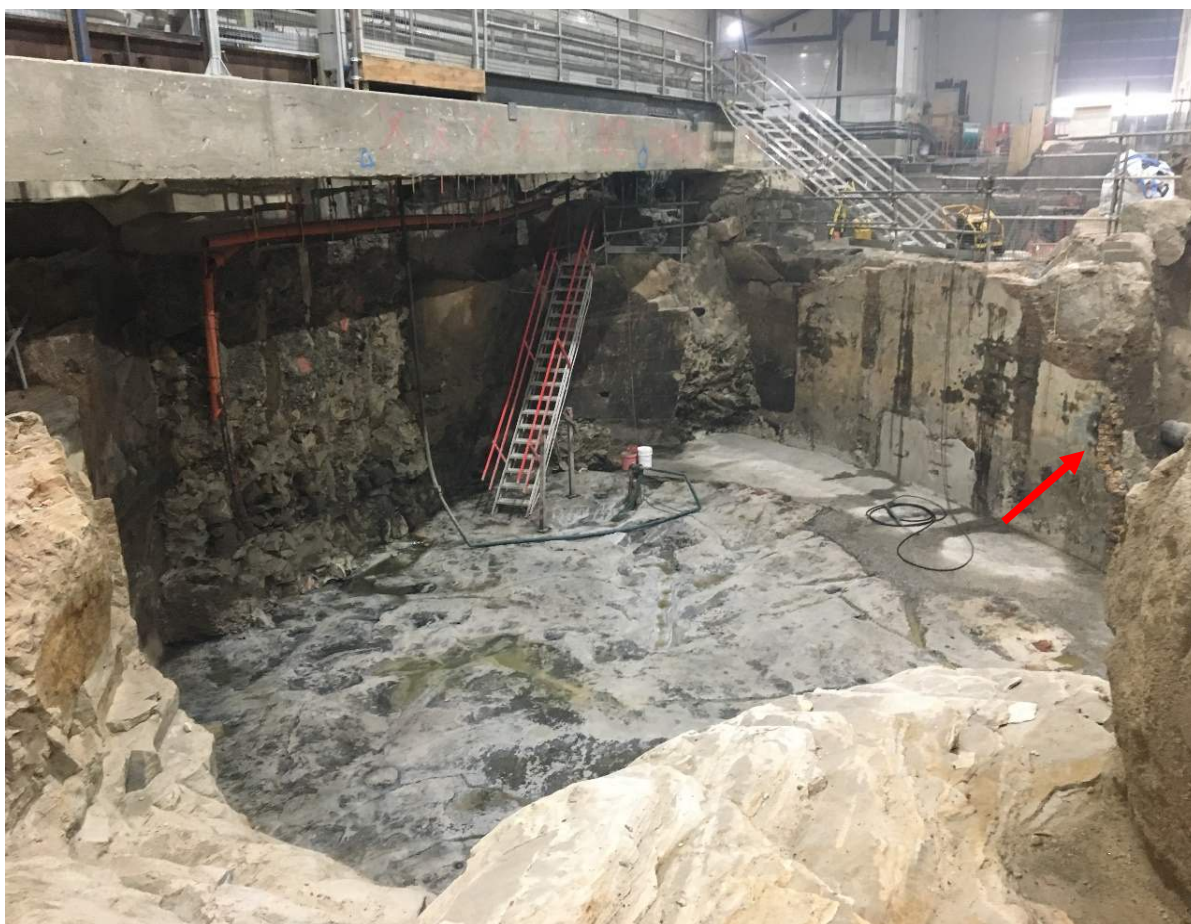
Excavation of the small gasholder under Hickson Road, cut into bedrock. A section of brick wall is visible to one side (arrowed). Lendlease 2019.
